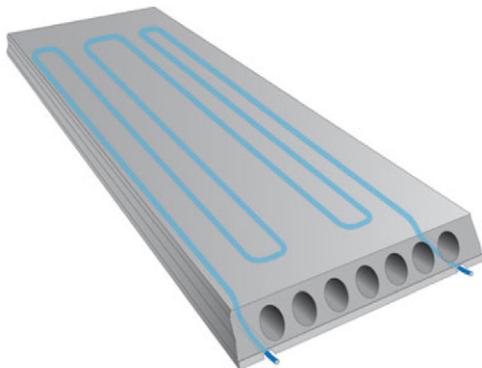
ThermoMax – Spæncom: prefabricated concrete ceiling deck element with integrated water pipes.
